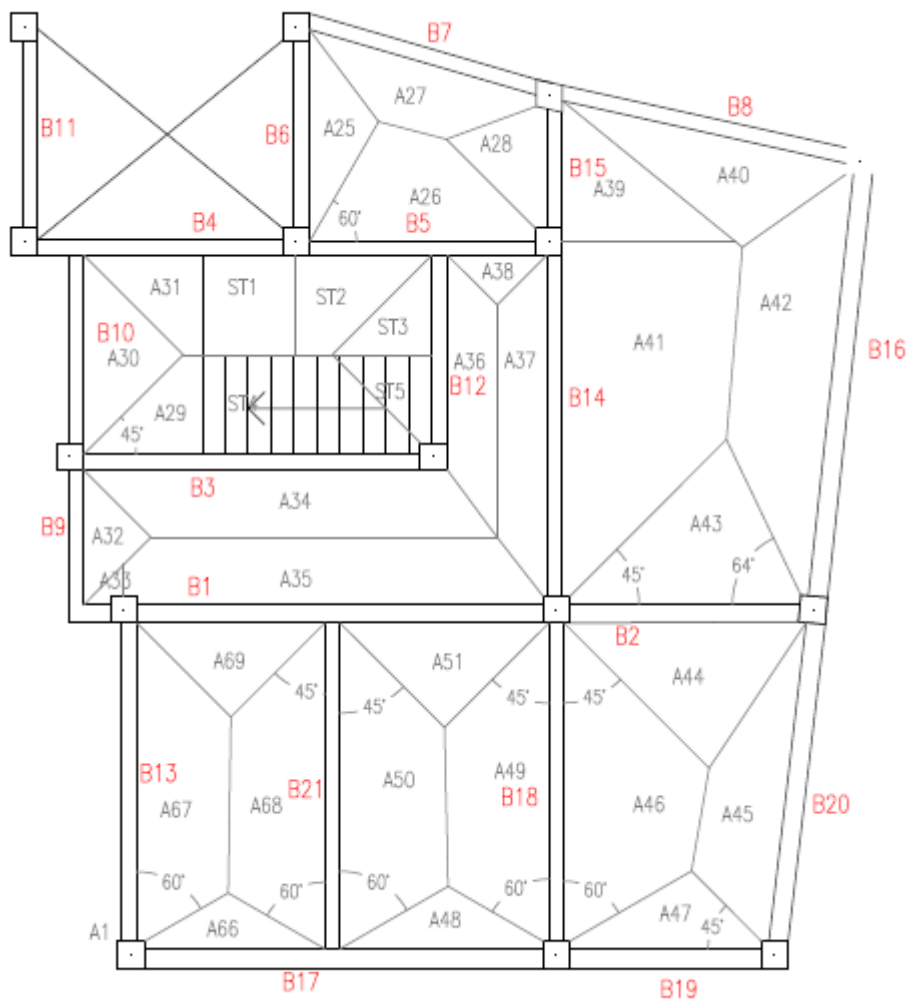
Distribution of Slab Load to the Beams - Ground Floor and Mezzanine Floor (z= 4m and 6.52m respectively)
